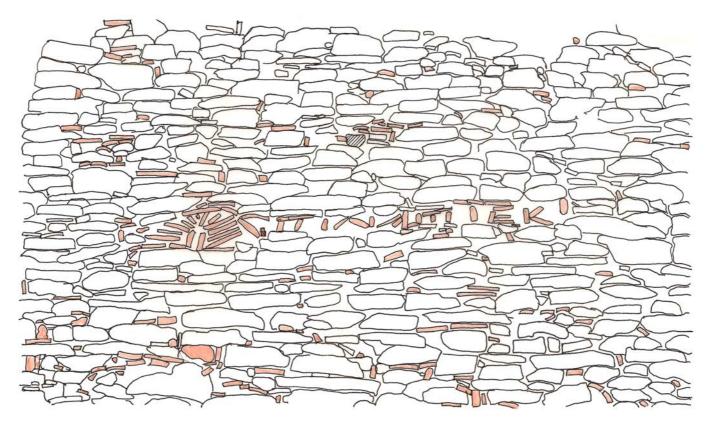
Angelokastro, SW building. Drawing of a section of masonry on the W façade.
